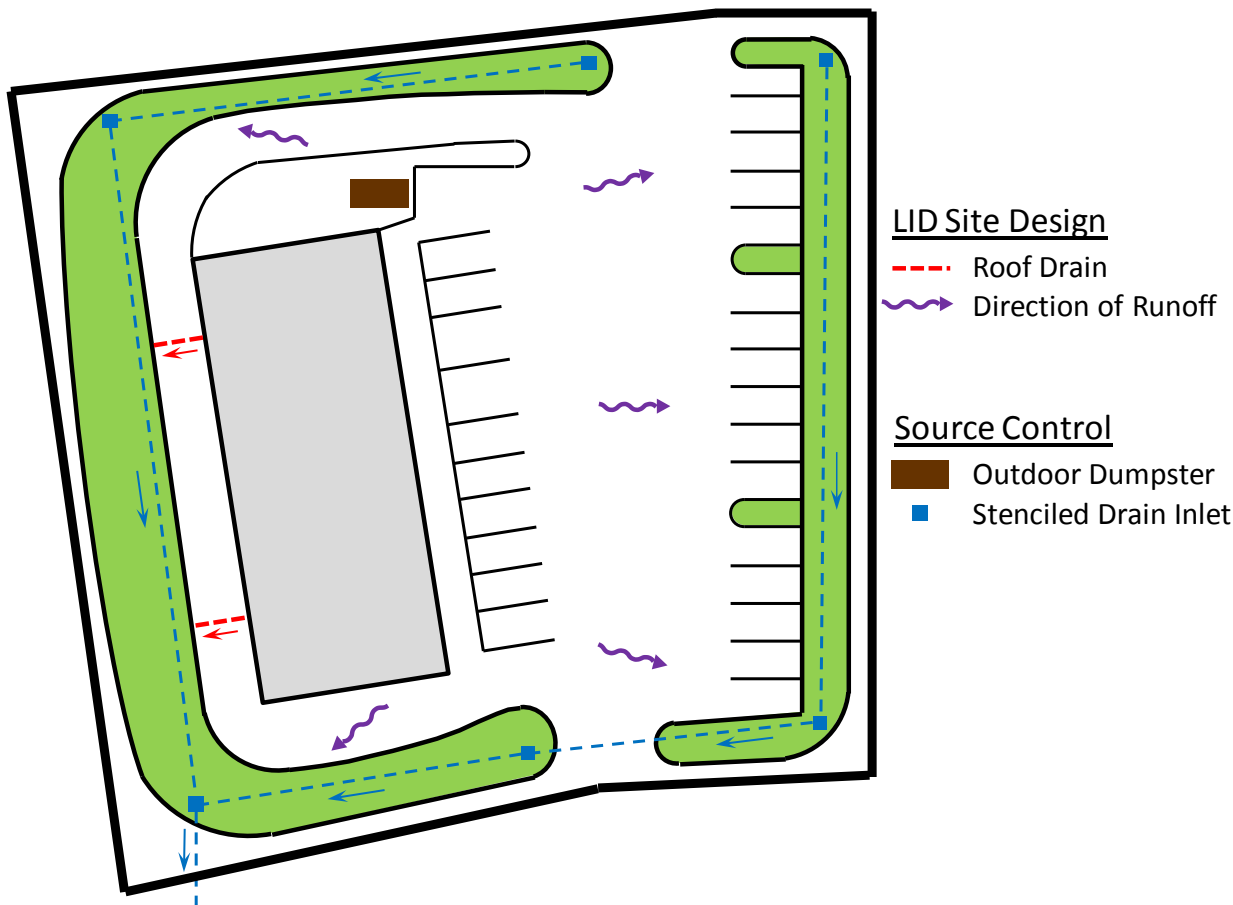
LID SITE DESIGN AND SOURCE CONTROL PLAN
